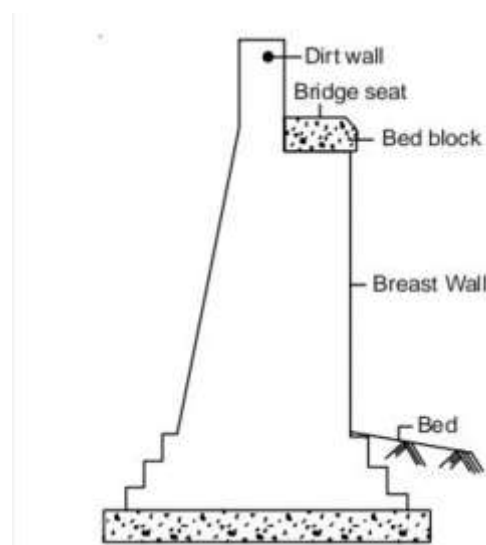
Typical abutment [Source: Design of Bridge Structures by T.R Jagadeesh and M.A. Jayaram]
